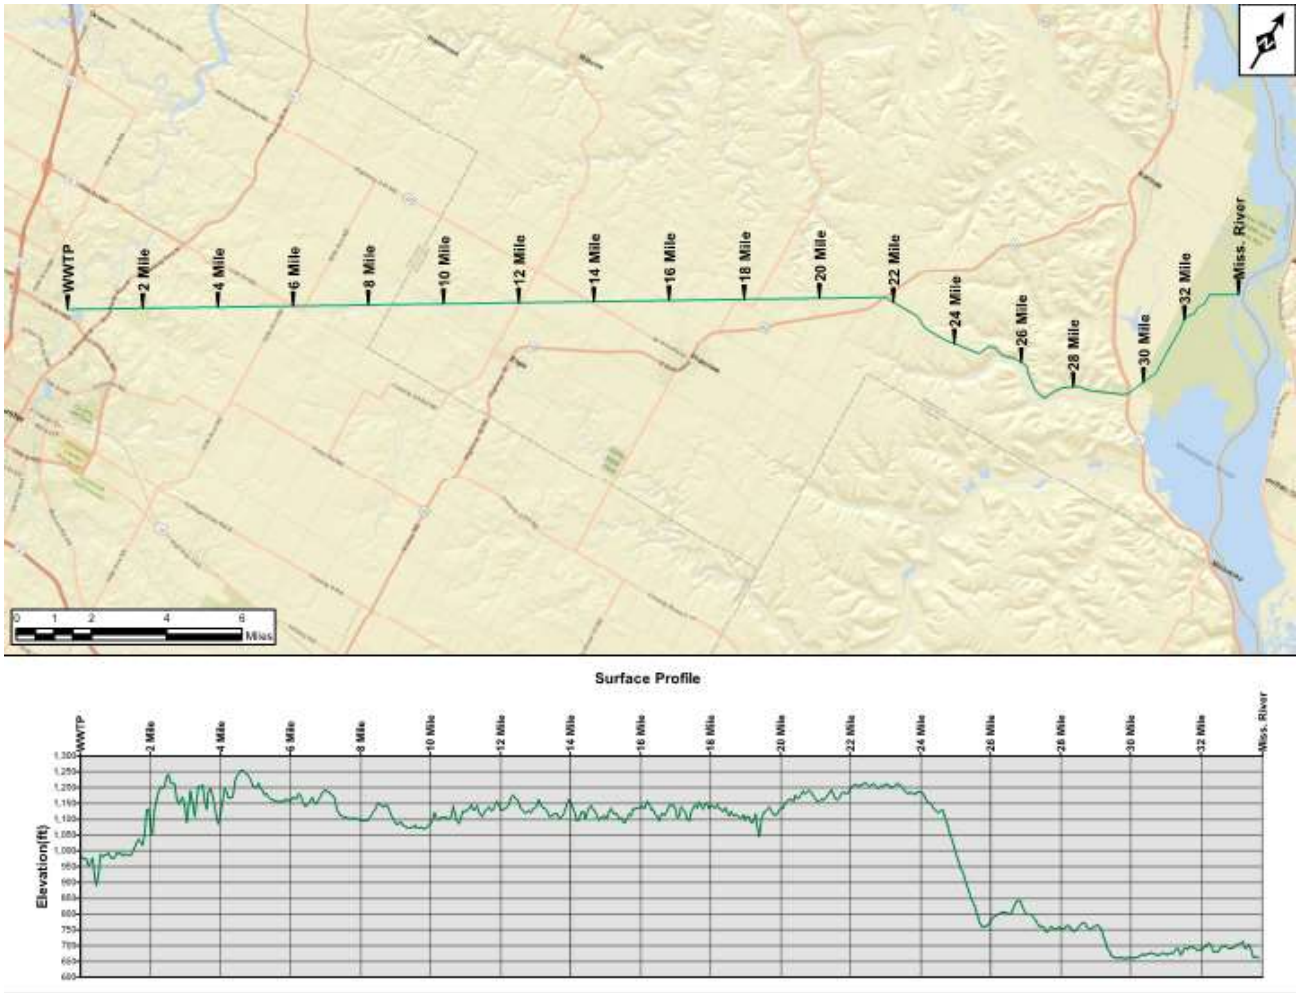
Potential Alternative Outfall Plan and Profile
